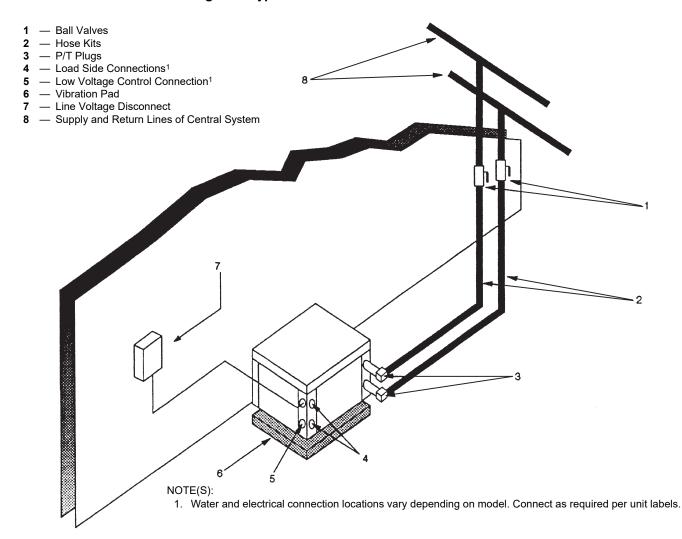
Typical Cooling Tower/Boiler Application (Source Side)
